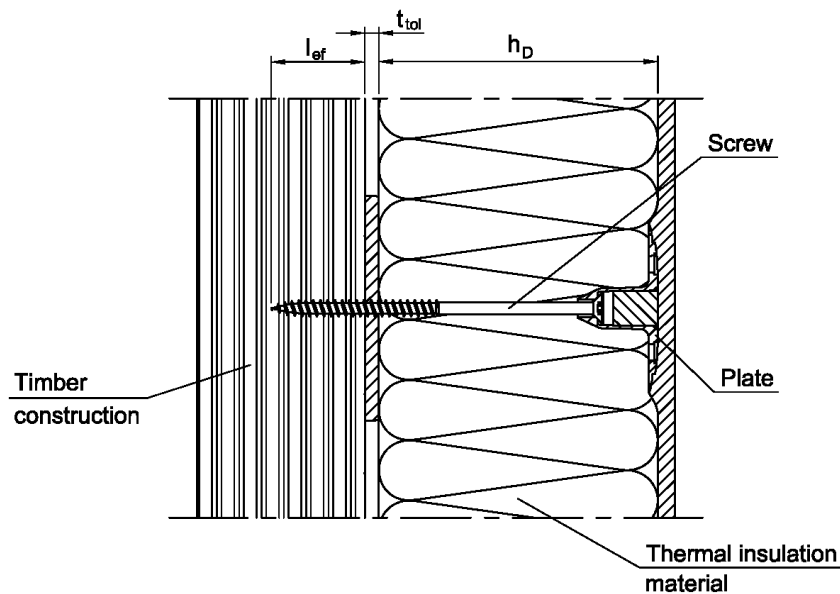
Example of the use of the fasteners – Substructure = timber construction
